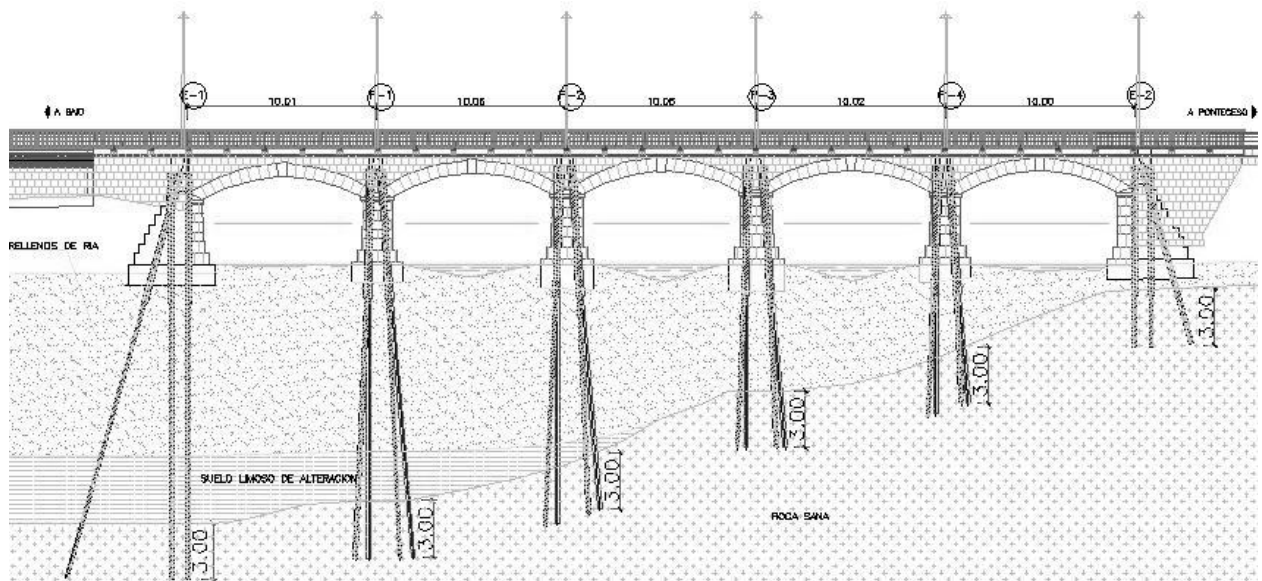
Example of micro-piling in abutments with piles both in the vertical and inclined position. These piles also penetrate through the full depth of the bridge to support the road deck. (Leon, 2004)
